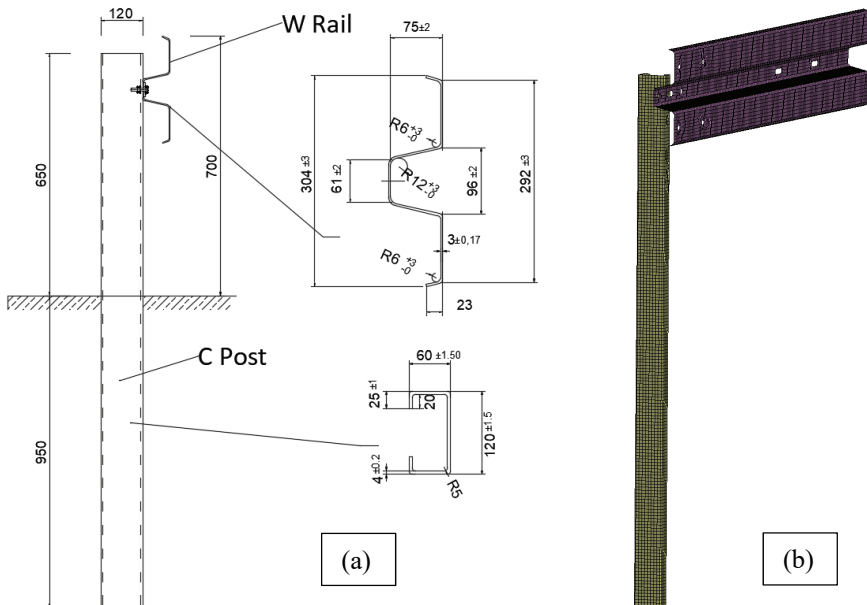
(a) H1W4 guardrail system details and (b) FE model of the design
